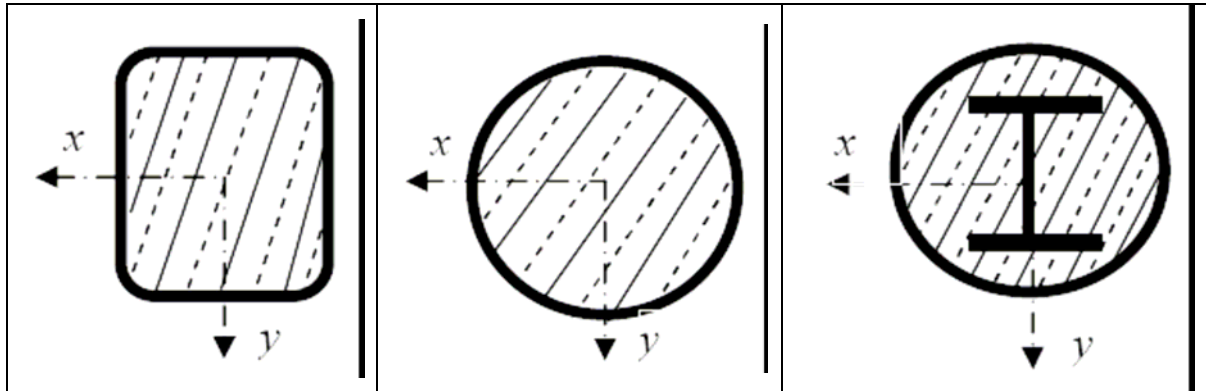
Typical cross-sections of concrete filled tubular sections.
